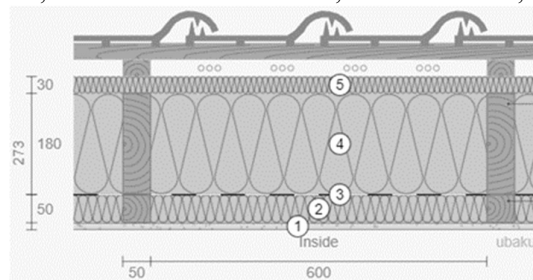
Timber frame panel construction - roof (1 - plasterboard 12.5 mm; 2 – mineral wool 50 mm; 3 - vapor barrier 0.5 mm; 4 - mineral wool 180 mm; 5 - hard mineral wool 30 mm)
